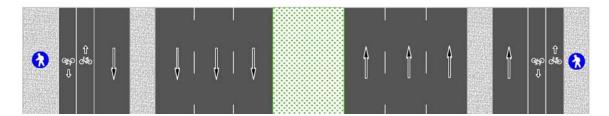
L: Morrissey Boulevard Alternative A Cross Section
